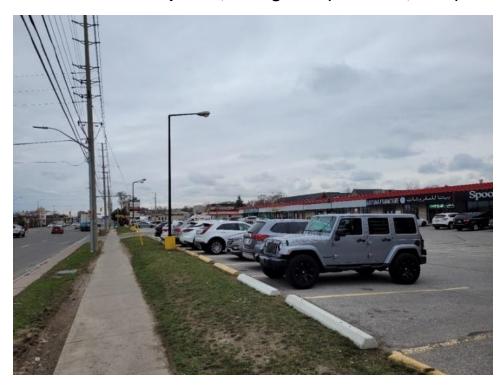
Typical ROW disturbance, utilities and grading, facing east (March 31, 2021)
